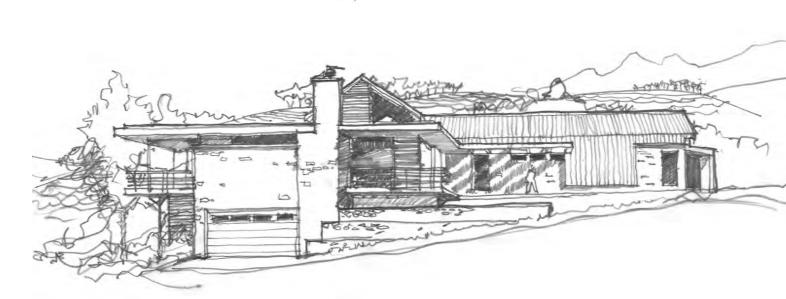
Design sketch showing the lower ground garage level and the breaking up of the massing of the building by employing different roofs and facade elements.
